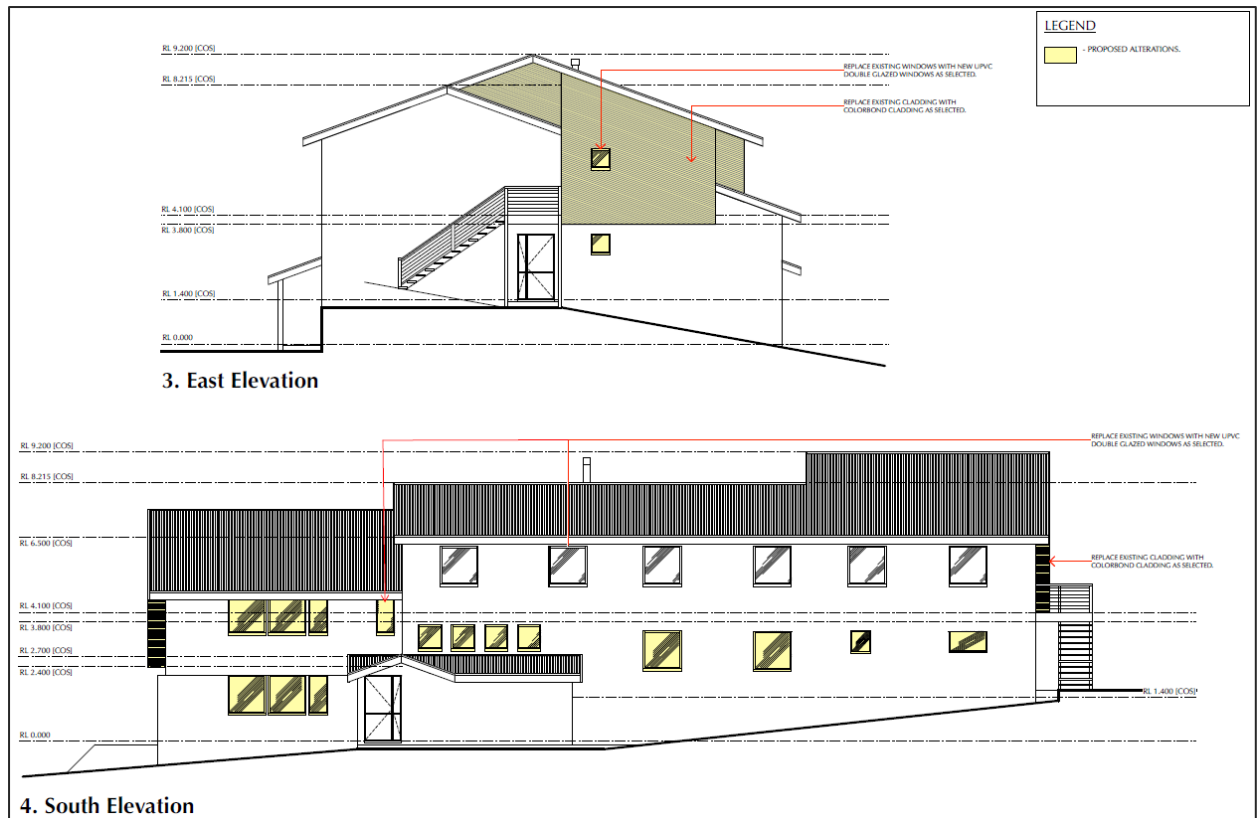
| Cladding and windows to be replaced on the East and South elevations (Source: Applicant's documentation)
